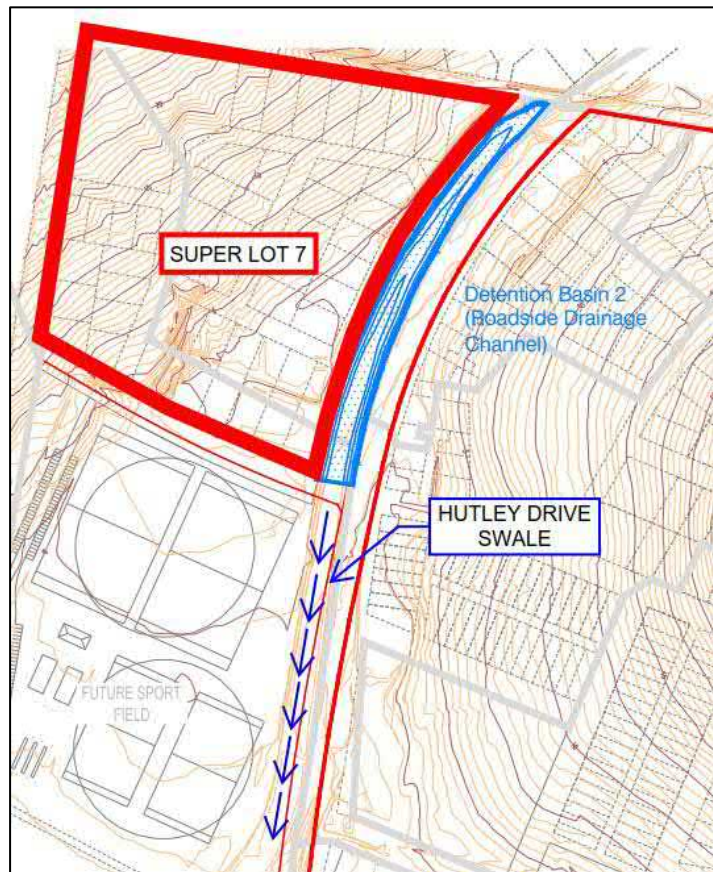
Extract from G+S Plan 10734-1.9-D
